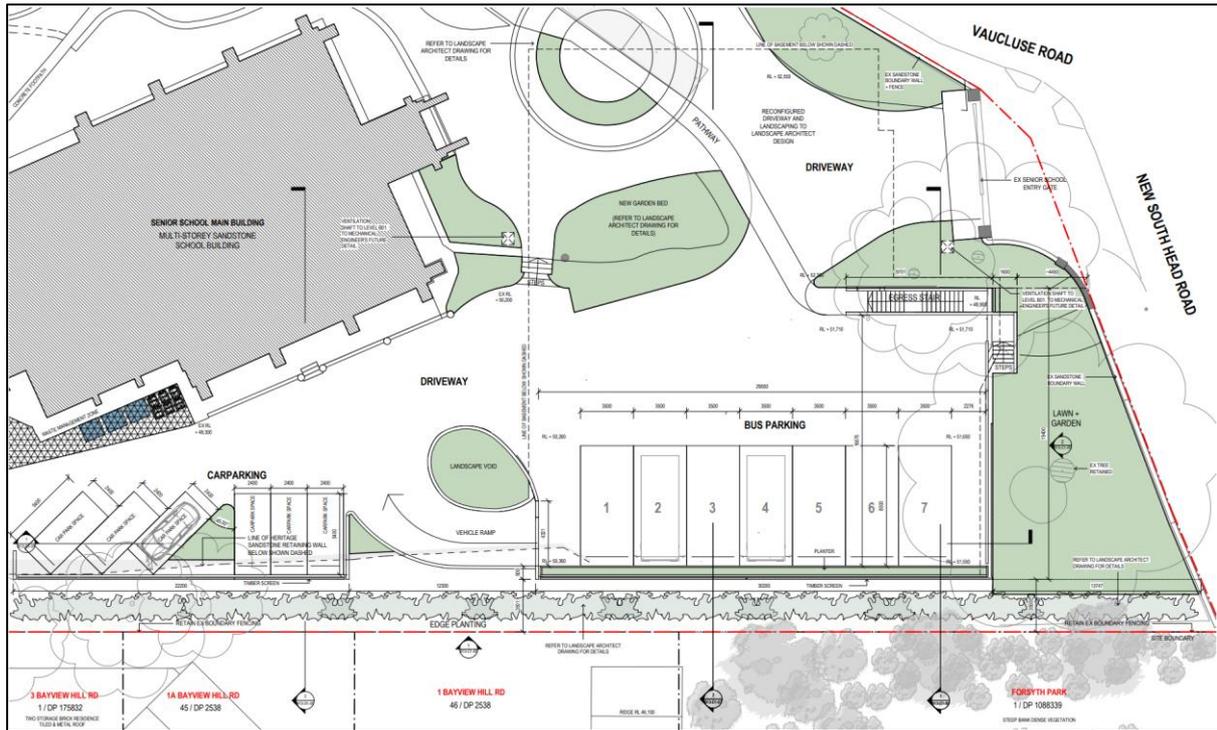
| Precinct B bus and car parking ground floor (Source: Applicant's RtS 2021)
